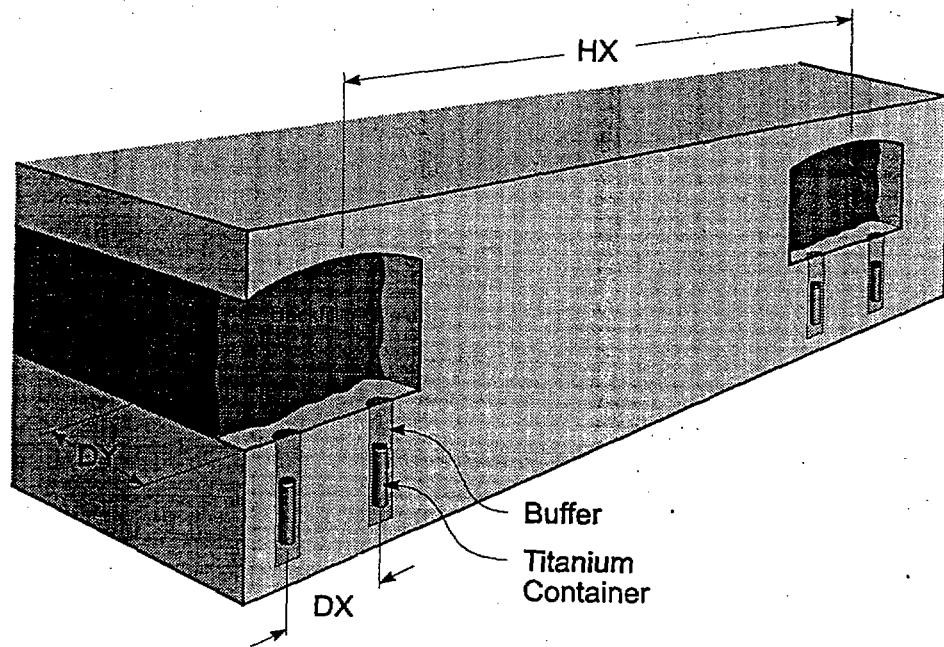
Waste Emplacement Geometry for an Underground Facility
